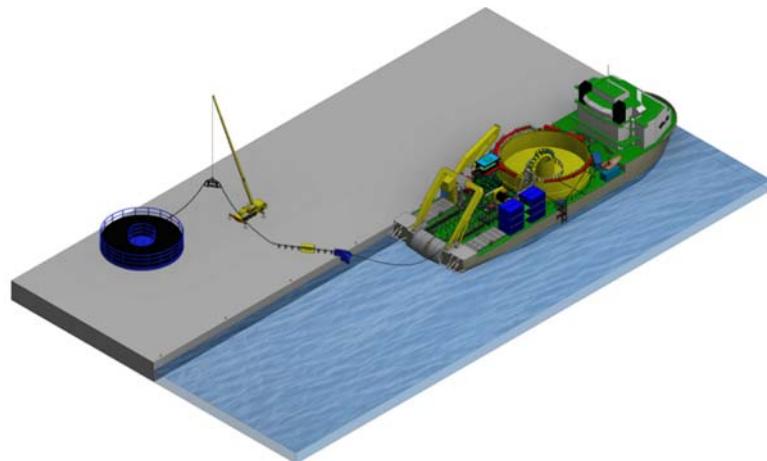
Cable Lay Vessel – Quayside set-up cable load out
